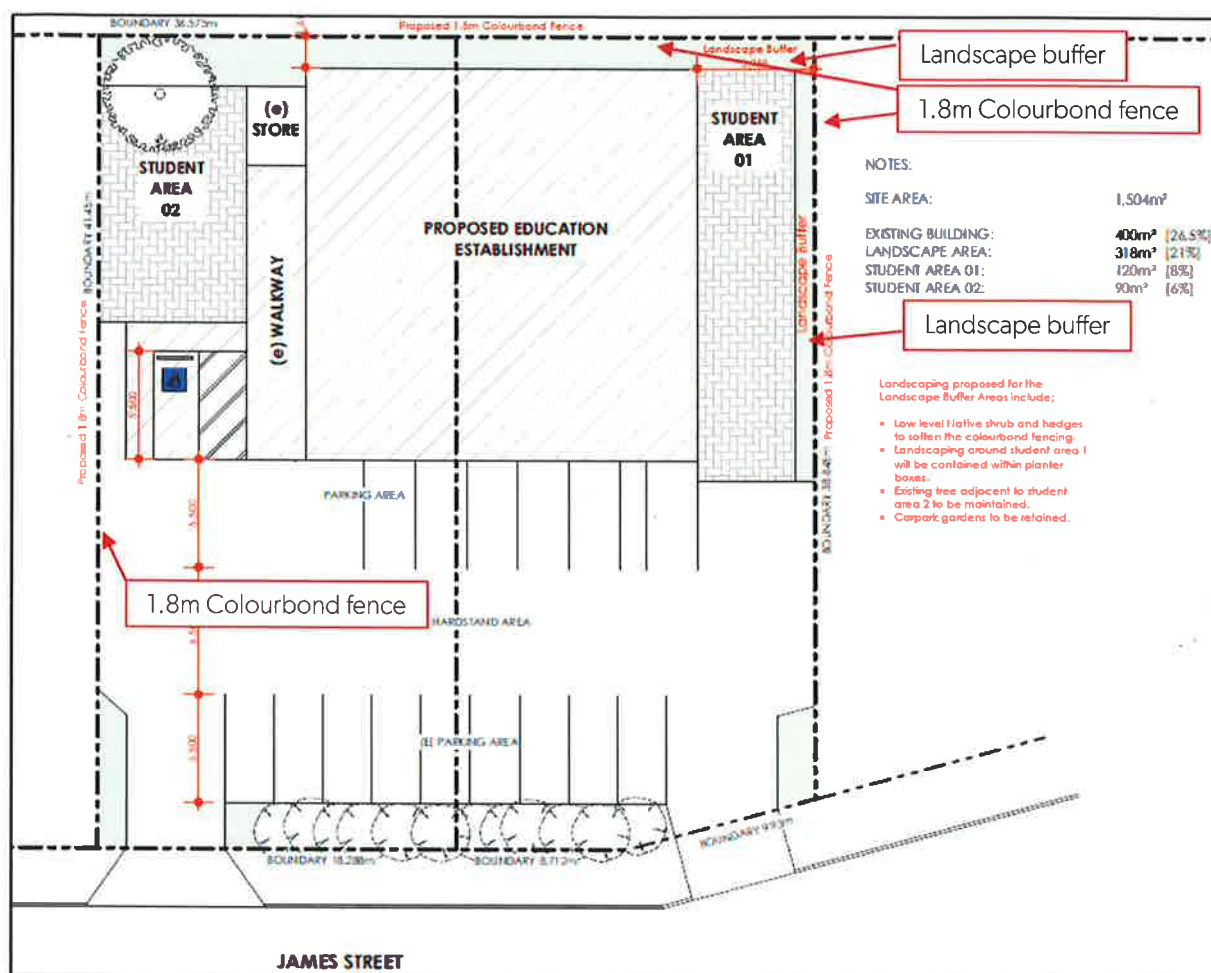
| Proposed Landscaping and Fencing Plan (Source: Applicant's RtS)
